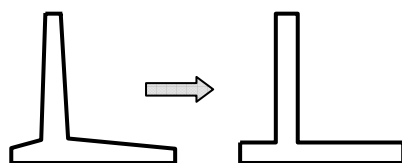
Simplification of the vertical wall shape of a reverse T-shape wall
